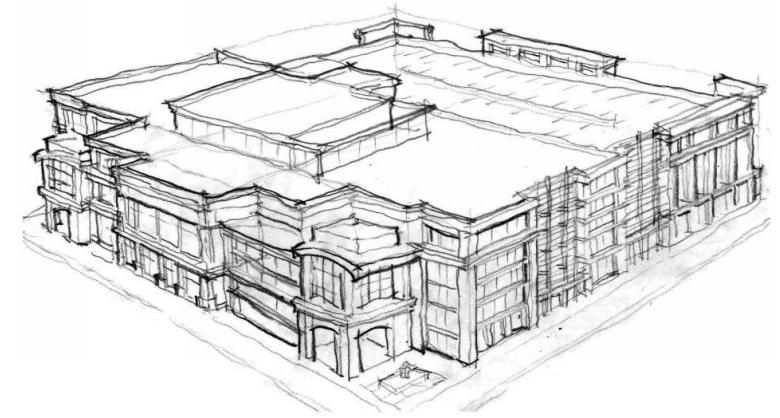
Conceptual Design Sketch of Proposed Building on Saint Mary's Property
